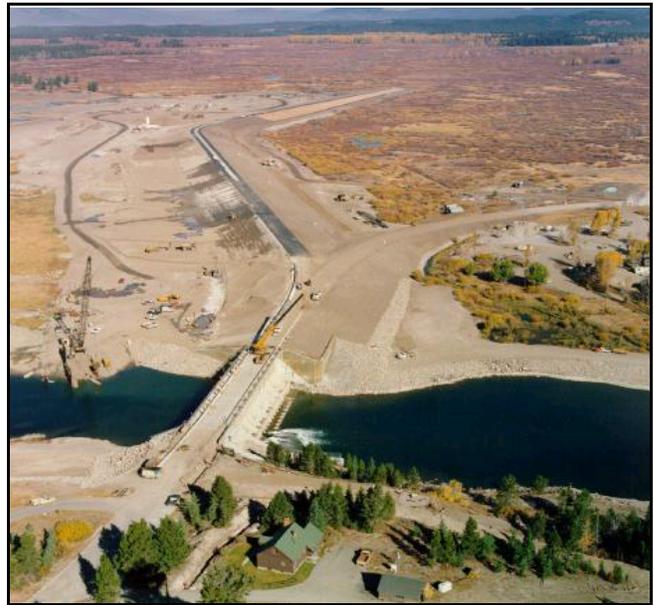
Aerial view of Jackson Lake Dam under construction looking north.
